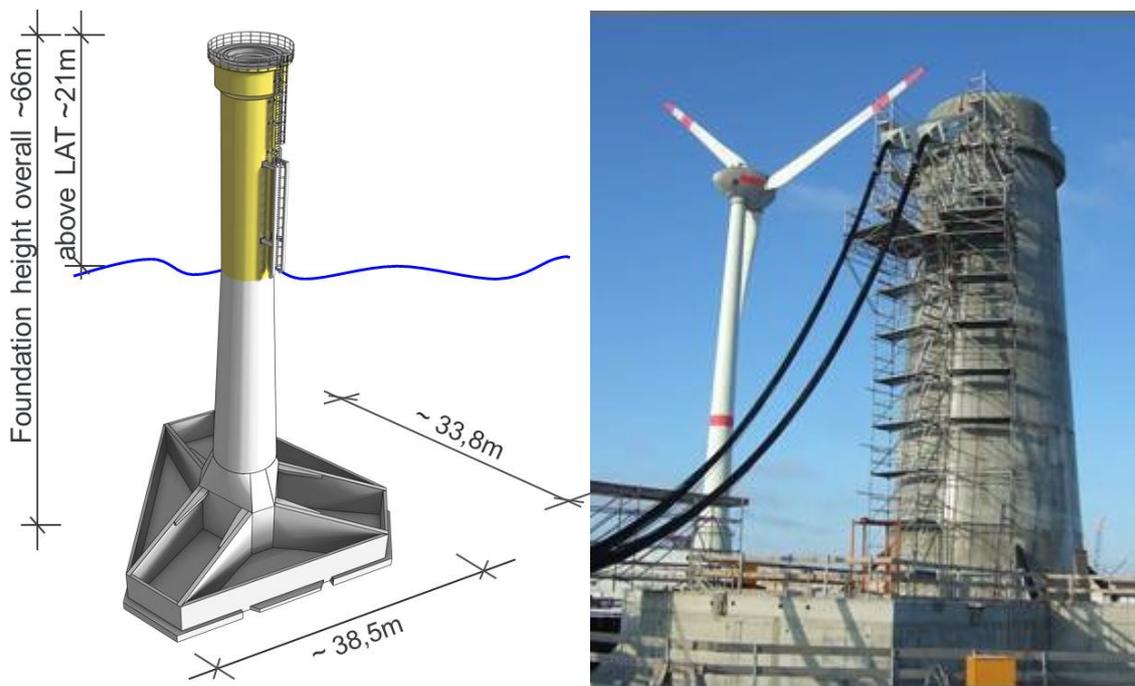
STRABAG-gravity base foundation: Construction details (left), and test foundation scale 1:1 at the factory premises in Cuxhaven (right) (source: WAHRMUND 2012)
